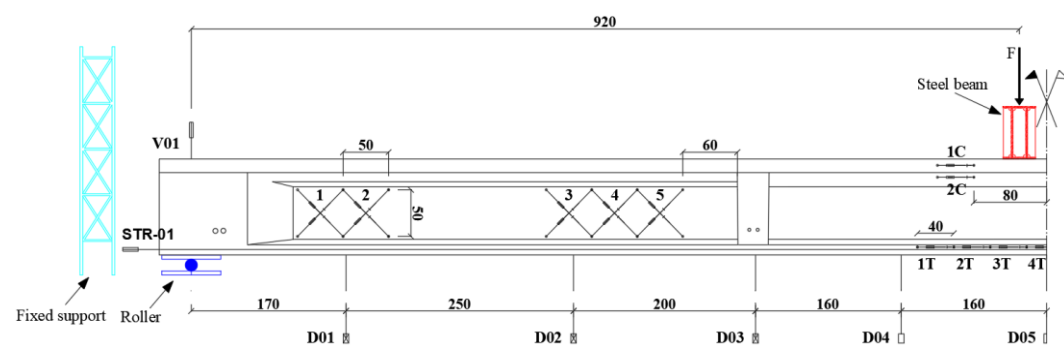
Test setup and layout of the monitoring system installed on B8-P47/46 girder (unit: cm).
